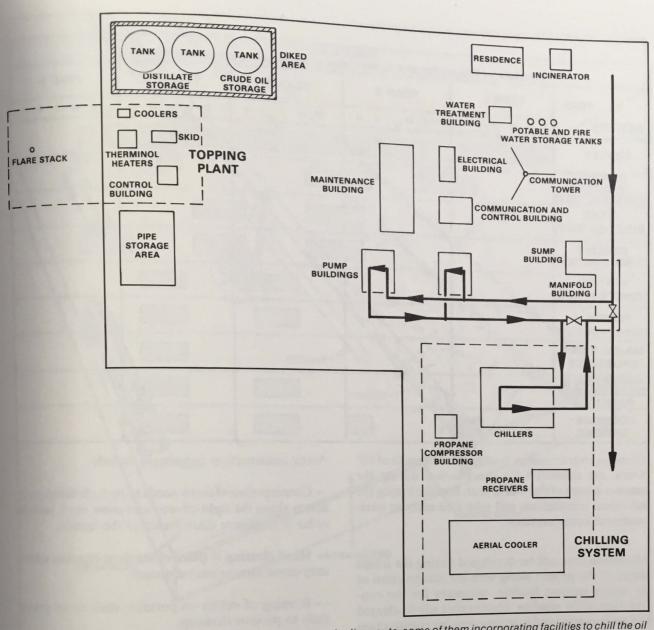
Pump stations will be constructed along the pipeline route, some of them incorporating facilities to chill the oil in order to control thermally induced stress in the pipeline and to prevent raising of soil temperatures. A typical gas turbine pump station is shown here.
